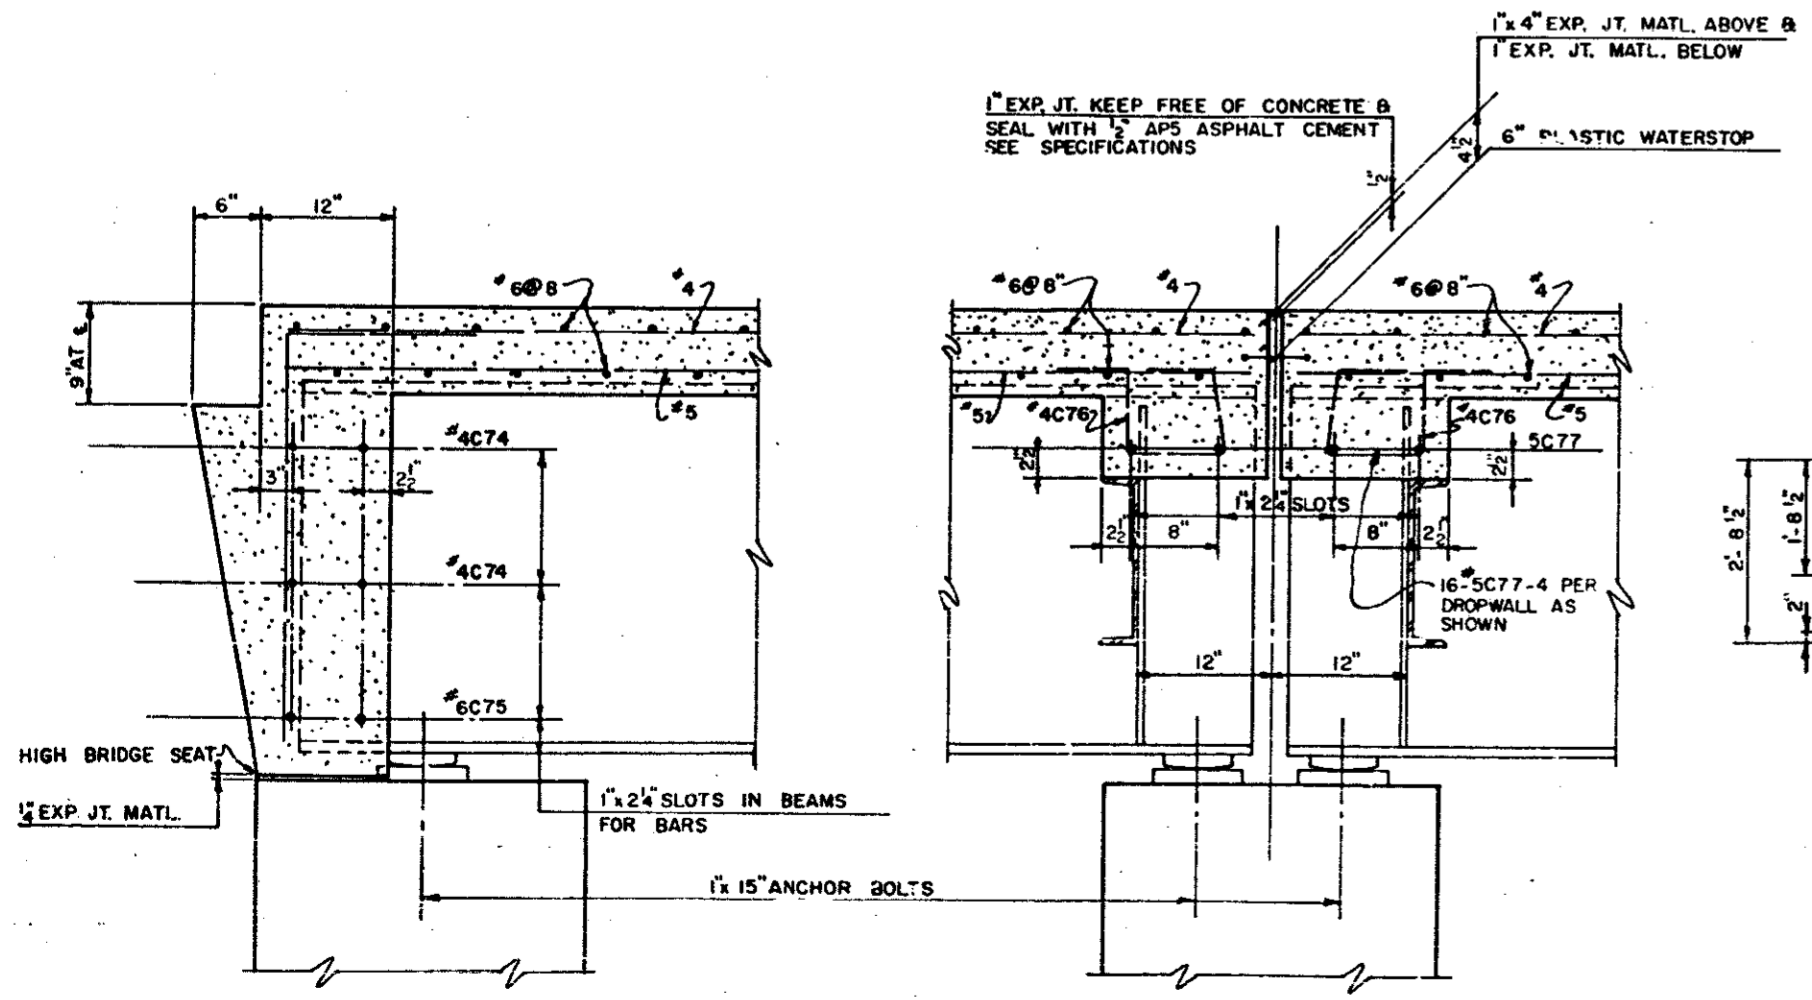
DETAIL - INTERIOR DIAPHRAGM CONNECTION
